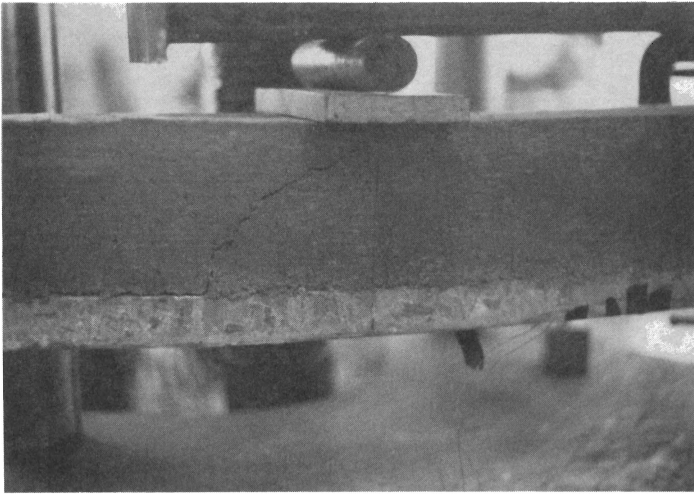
TYPICAL FAILURE PATTERN FOR SHEAR TEST SPECIMENS
